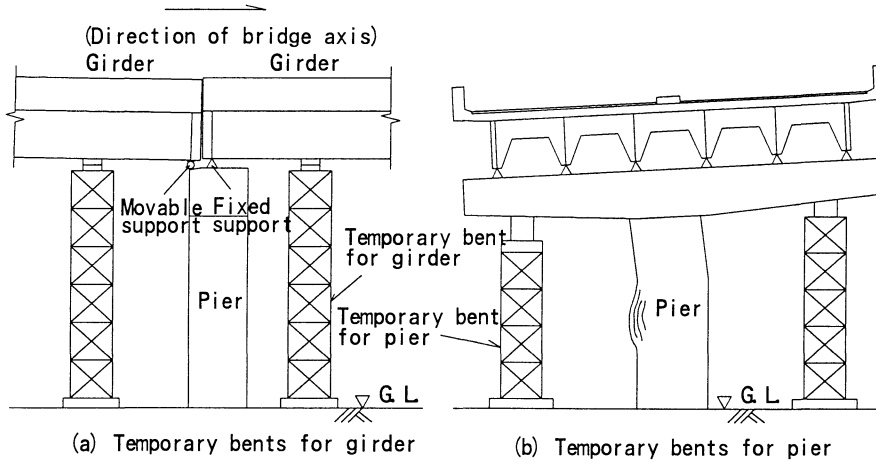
Temporary supports for damaged girders and piers.
